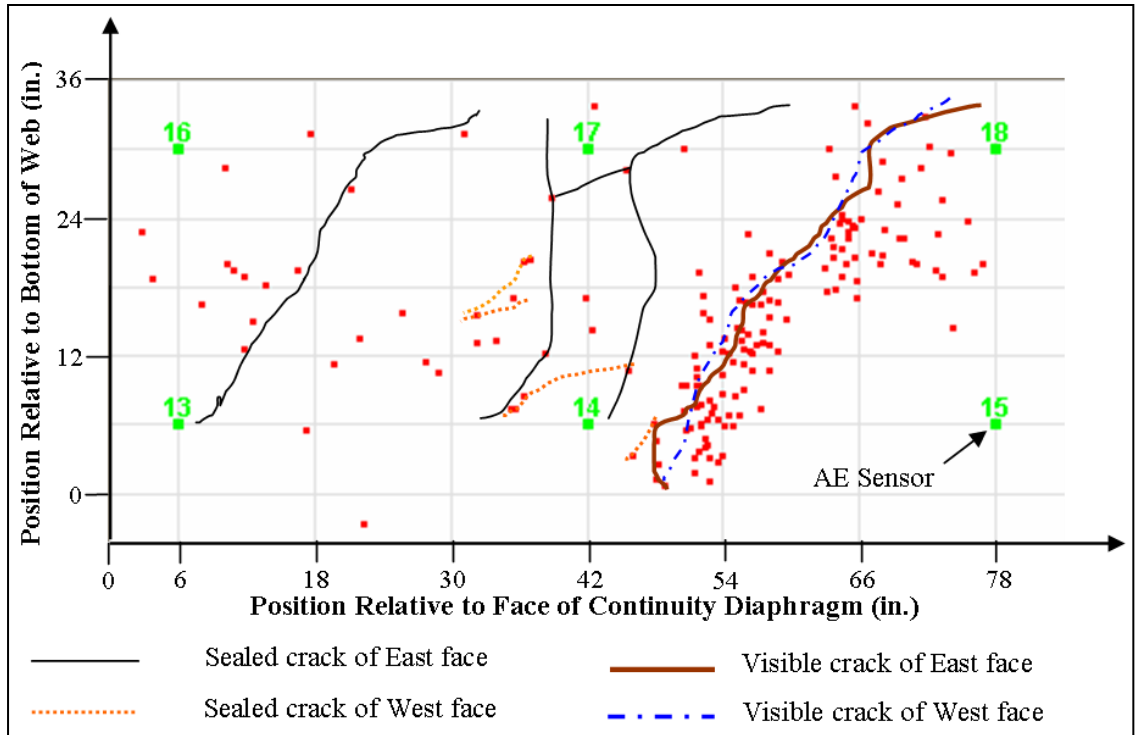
AE event location and crack pattern of Span 11 Girder 8 (Xu 2008)
